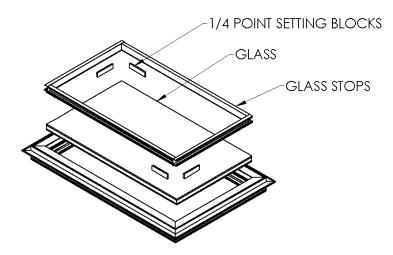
Glass Installation (Casement Hinge Side Left Shown)
